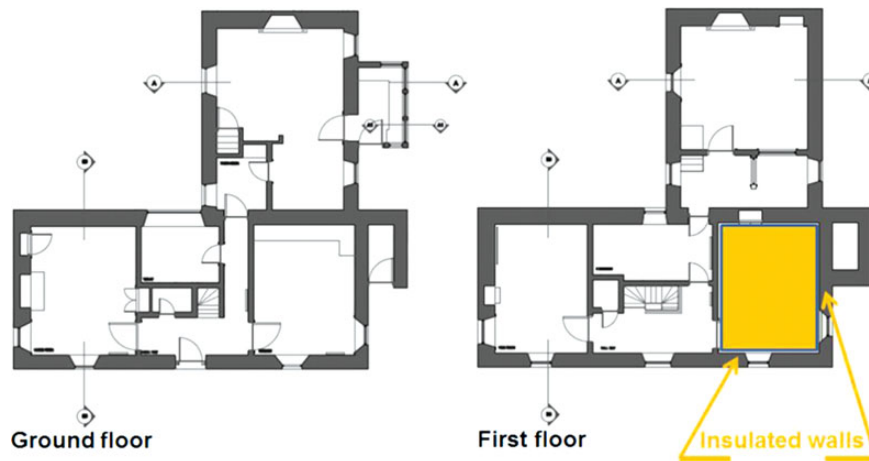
Floor Plans (from left, ground and first floors). The trial was carried-out as a feasibility study; thus only two external walls in one room were insulated.
